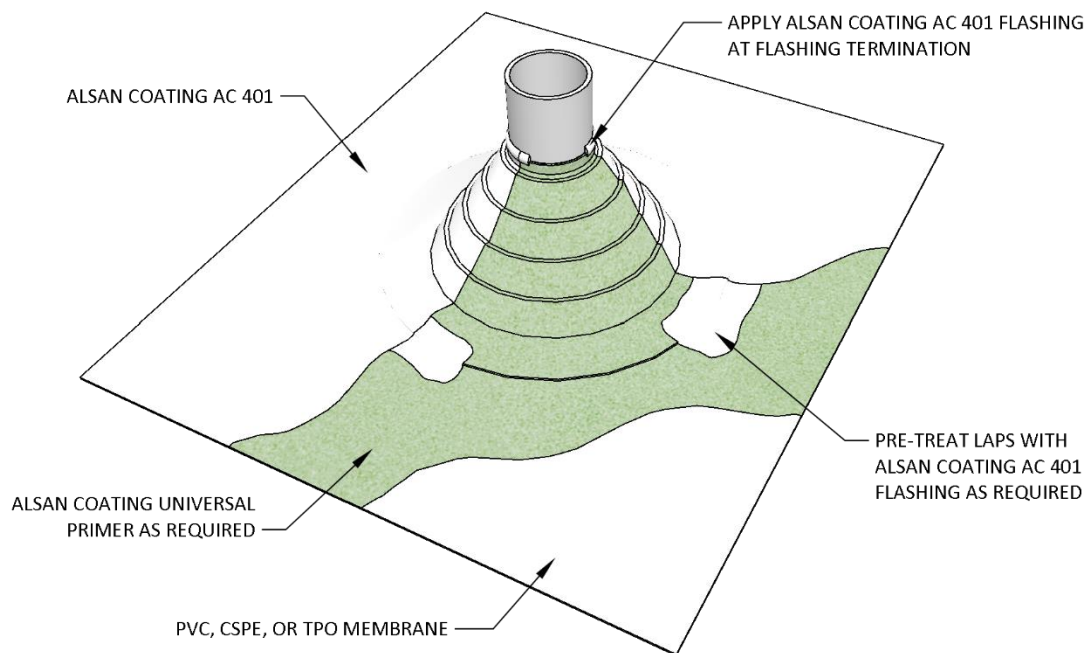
Acrylic Roof Coating Over TPO/CSPE/PVC, Penetration
